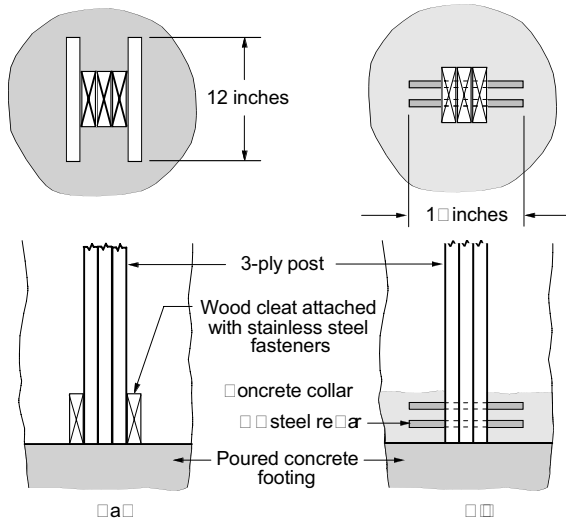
Post foundations with poured-in-place concrete footings. Uplift resistance provided by (a) wood cleats, and (b) concrete collar attached to post with steel rebar.
